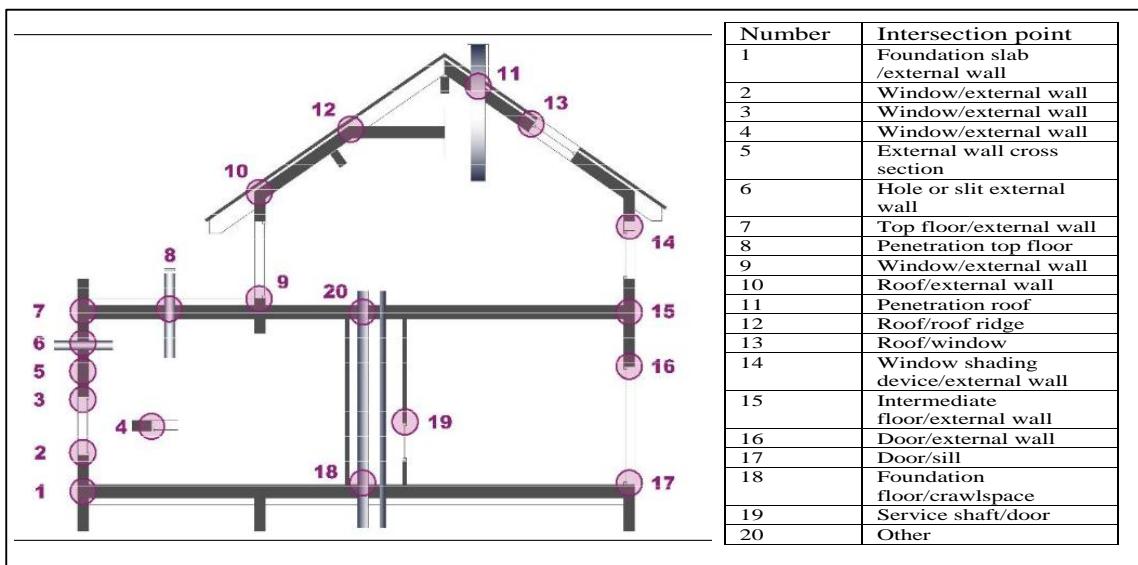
Locations in the building envelope prone to air tightness problems [71].
